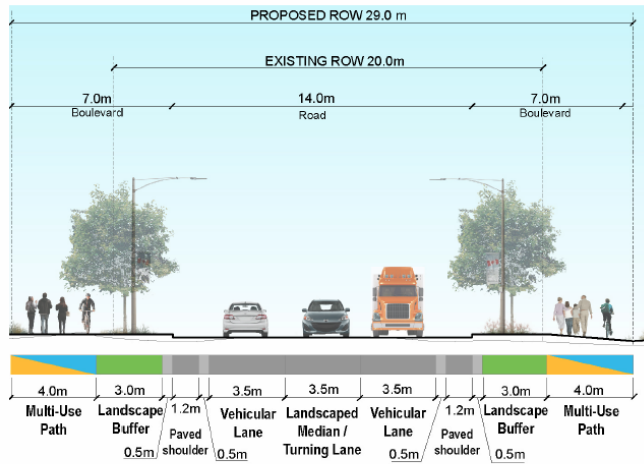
Preferred Reesor Road Cross-Section (typical mid-block condition)
